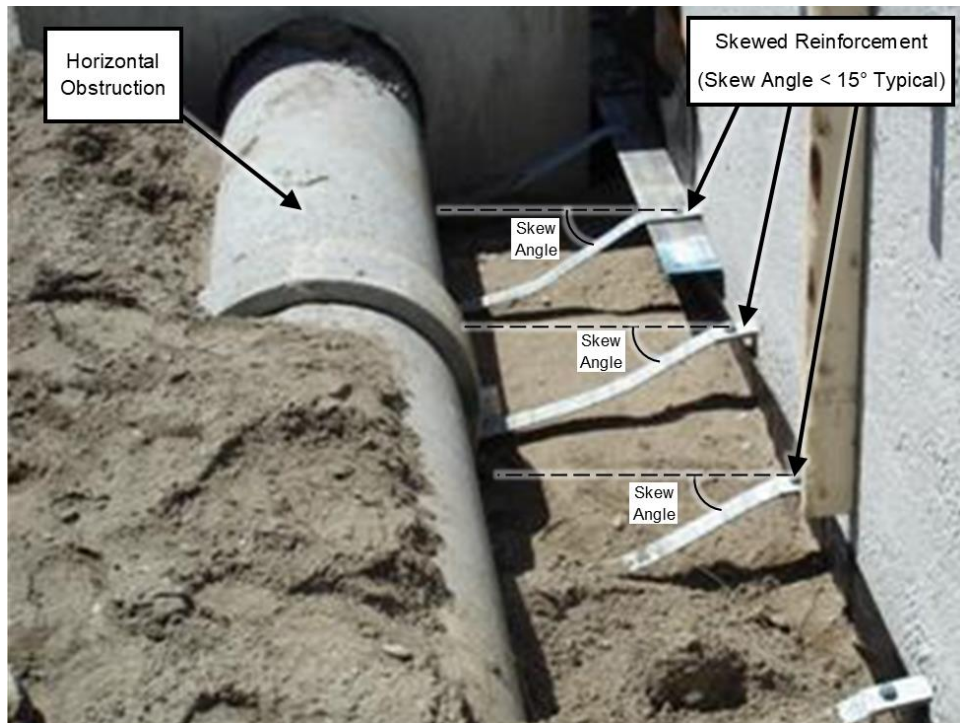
Example soil reinforcement skewing around horizontal obstruction
